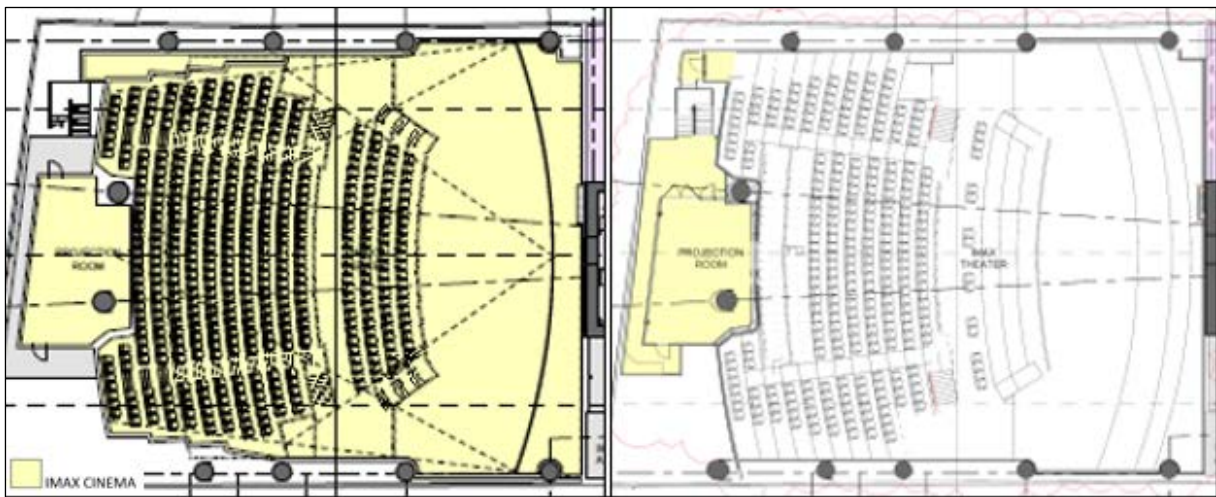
| Existing (left) and proposed (right) Level 4 layout (Source: Applicants EA)
